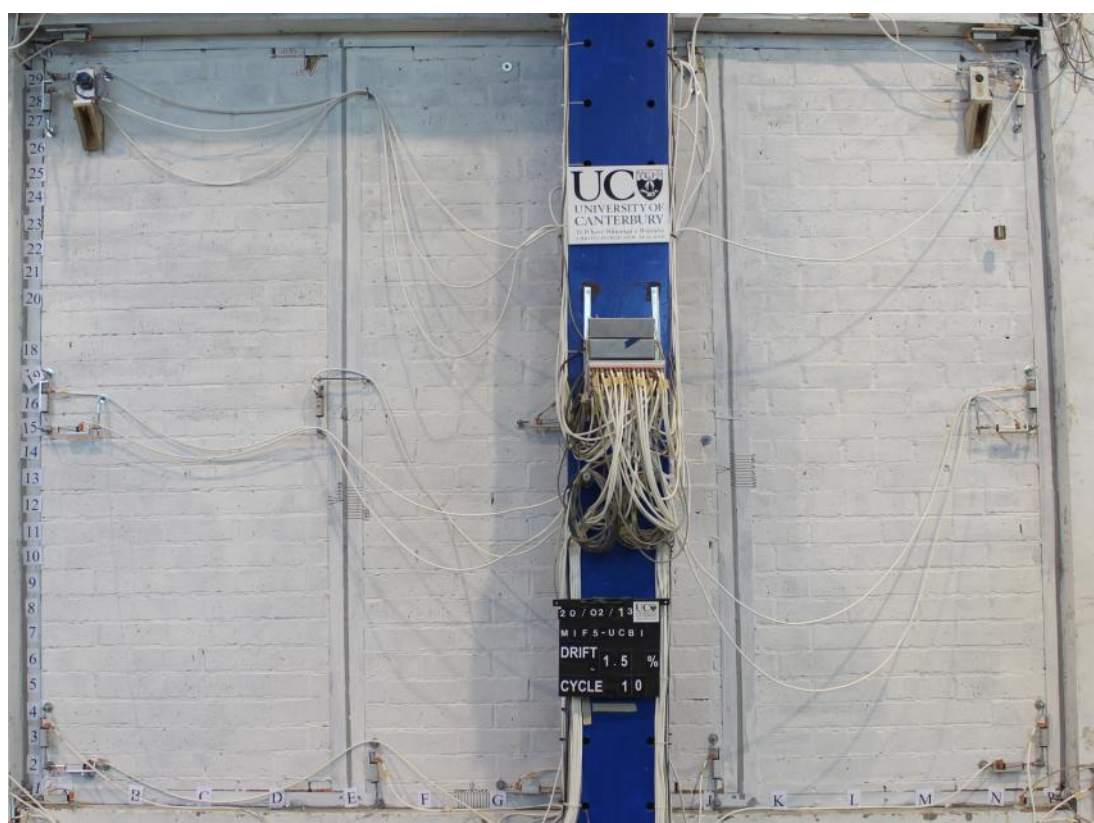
Completed low damage unreinforced clay brick infill wall specimen MIF5-UCBI
